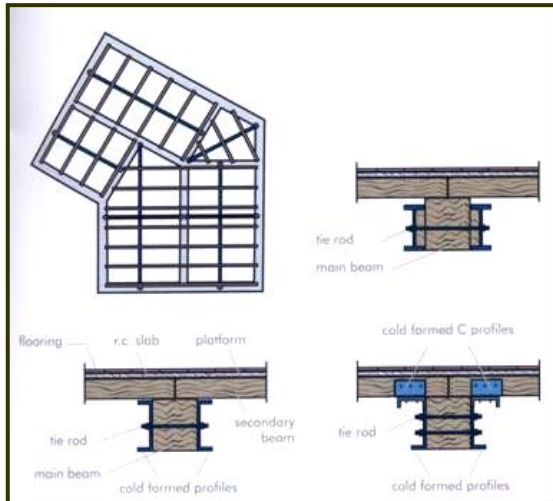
Consolidation techniques for wooden beams in floor structures, operating from the bottom to the top.
